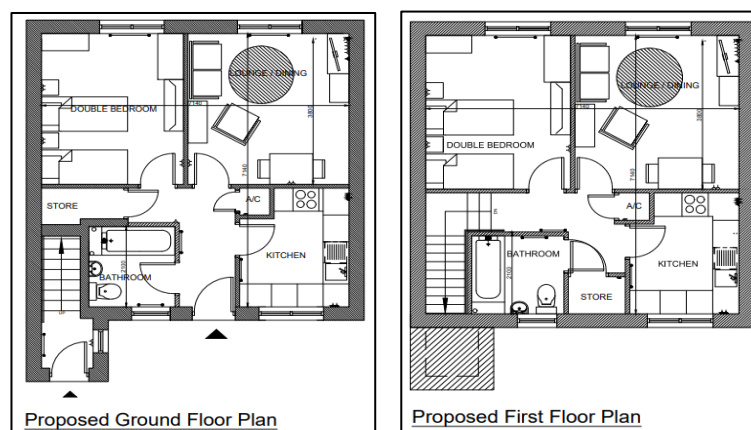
Ground and First Floor Plan – Blocks 7, 9 and 12
